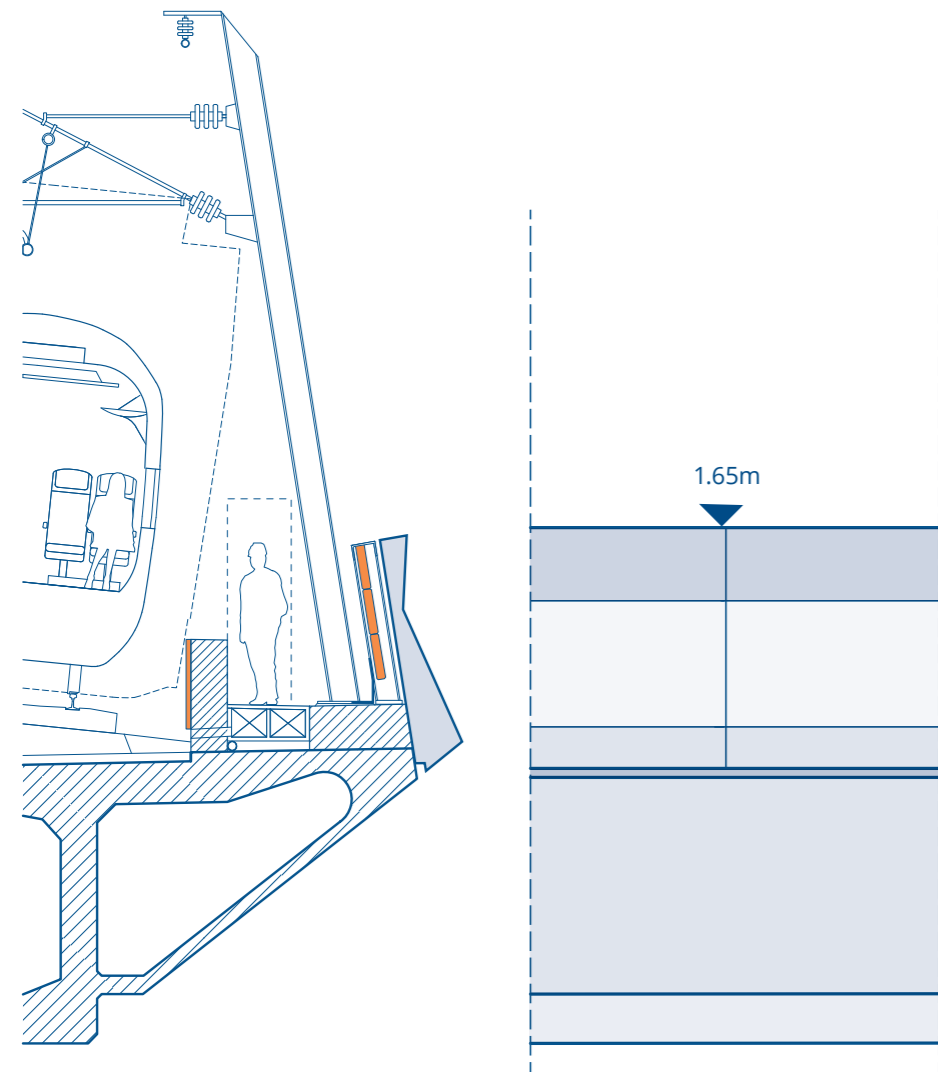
\_ Section and elevation - 1.65m opaque barrier
